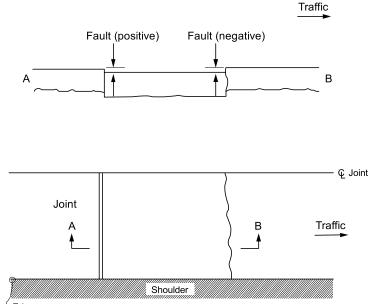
Faulting of Transverse Joints or Cracks (See Section 10.1)
